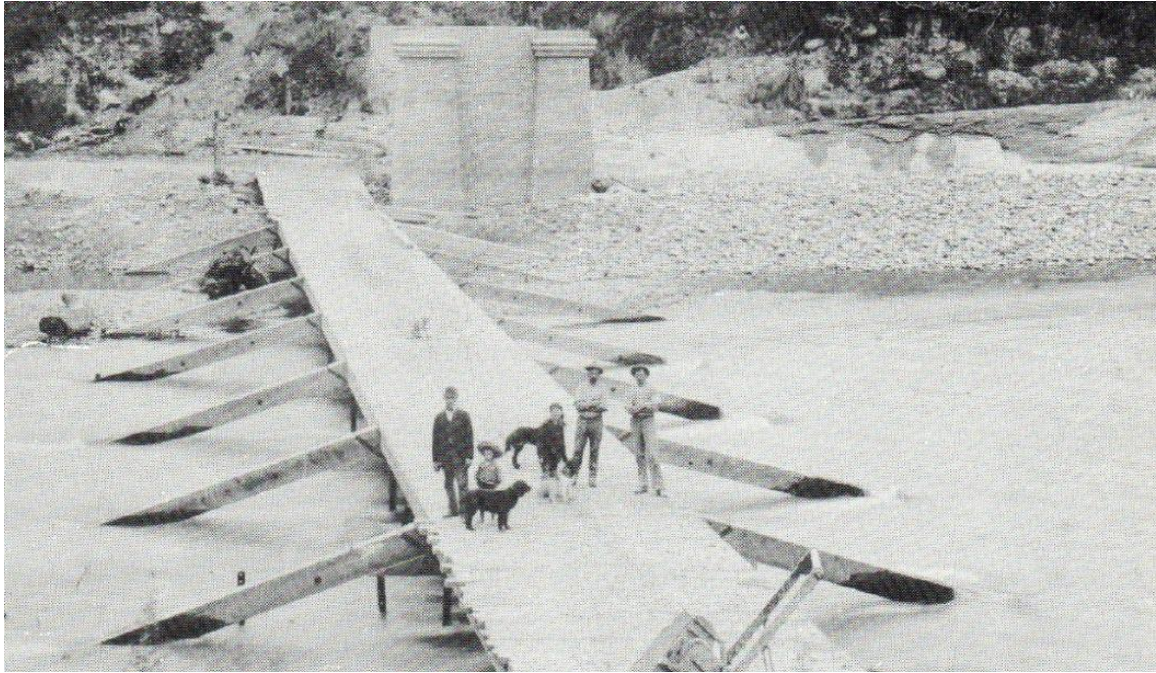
Low level bridge in with western pier for permanent bridge in background (reproduced from Laurenson 1979)
